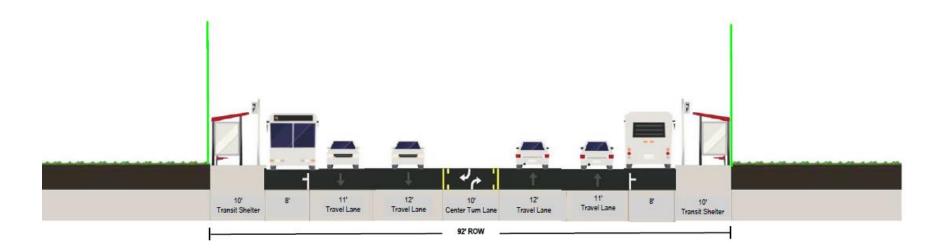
Typical Cross Section for Alternative A along Holt Boulevard
